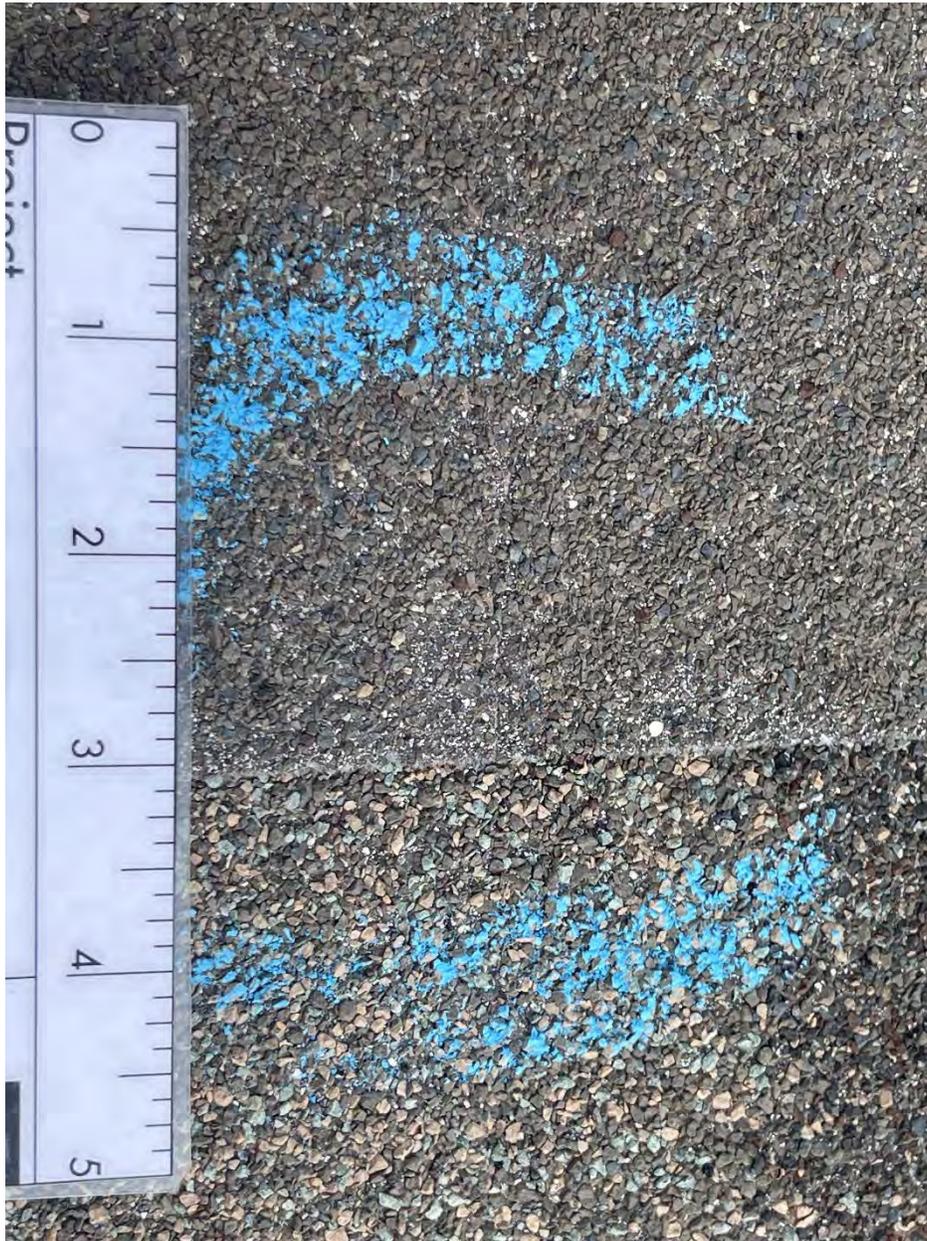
Example of ridge of Building 21. Note the singular blemish.
